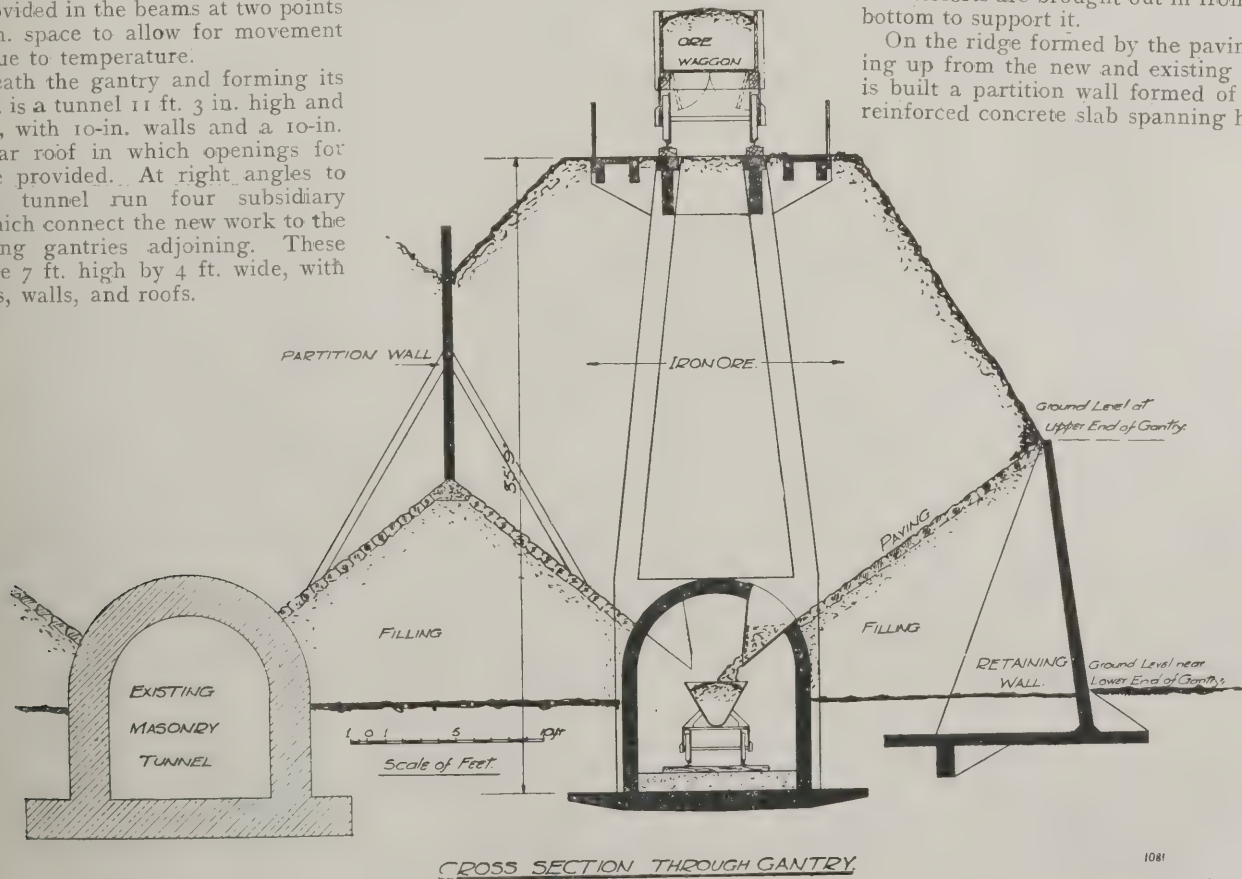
ORE STOCK GANTRY, MIDDLESBROUGH: SECTION.
